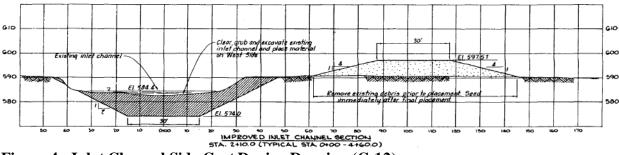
Inlet Channel Side Cast Design Drawing (C-12)
